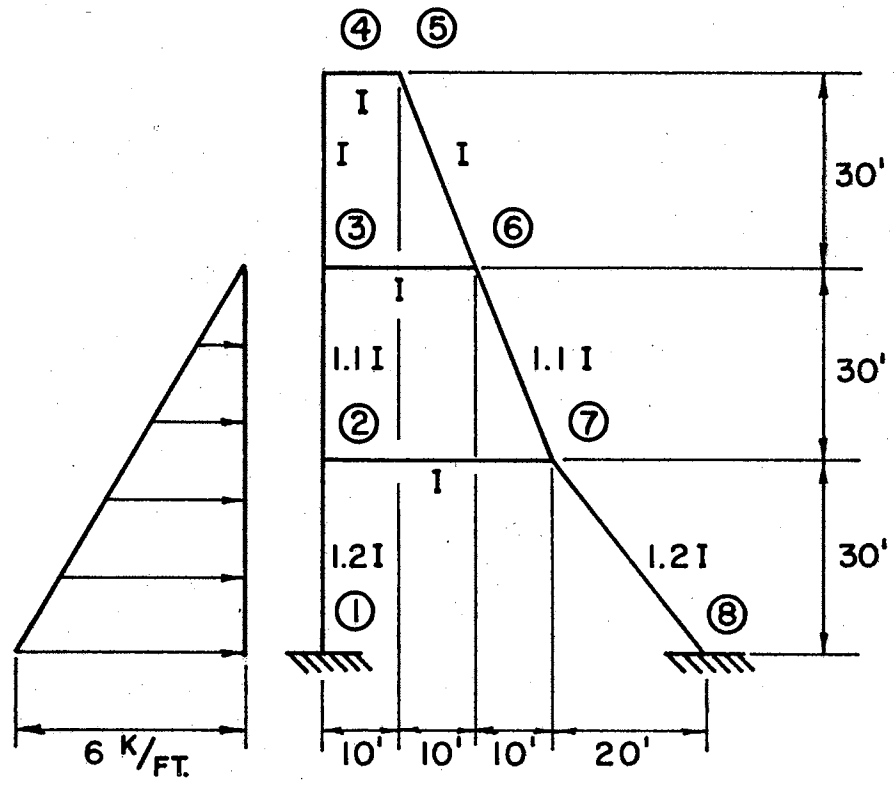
One Vierendeel Truss (Typical for Dam).
